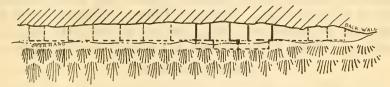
Walnut Canyon—Generalized section of a cliff house based particularly on house 746. This section illustrates the way the dwellers in the canyon made use of the overhanging limestone rocks; how the walls were constructed and the floors leveled
